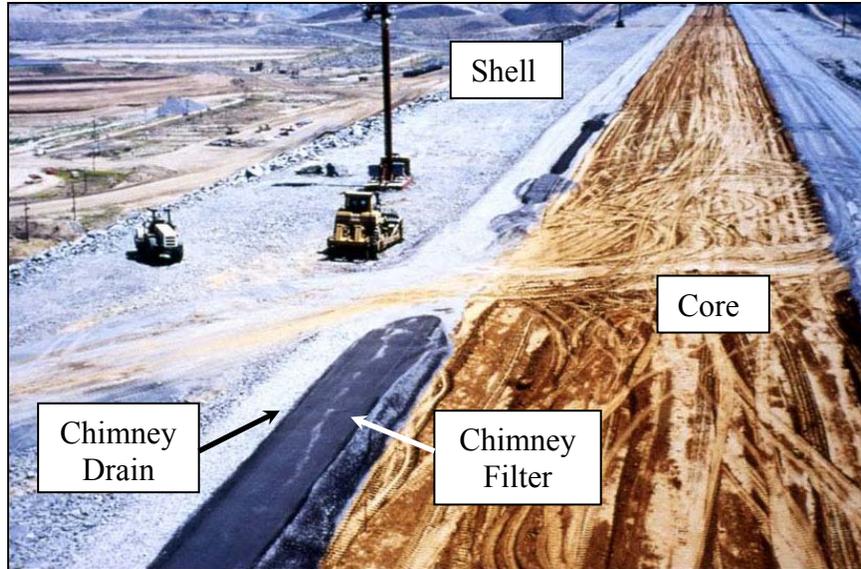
Haul road crossing of a chimney filter and drain.
